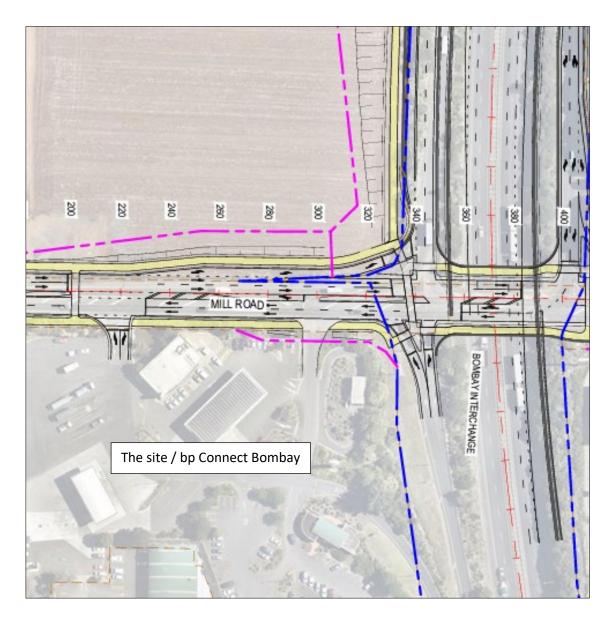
Excerpt of the NoR 3 General Arrangement Plan (sheet 41) showing the site.
